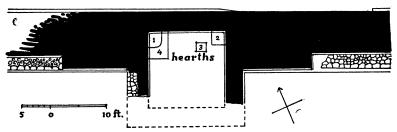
A TURRET, RECESSED INTO THE BROAD WALL, REDUCED TO NARROW WALL ON EITHER SIDE (WILLOWFORD WEST, 48B).
